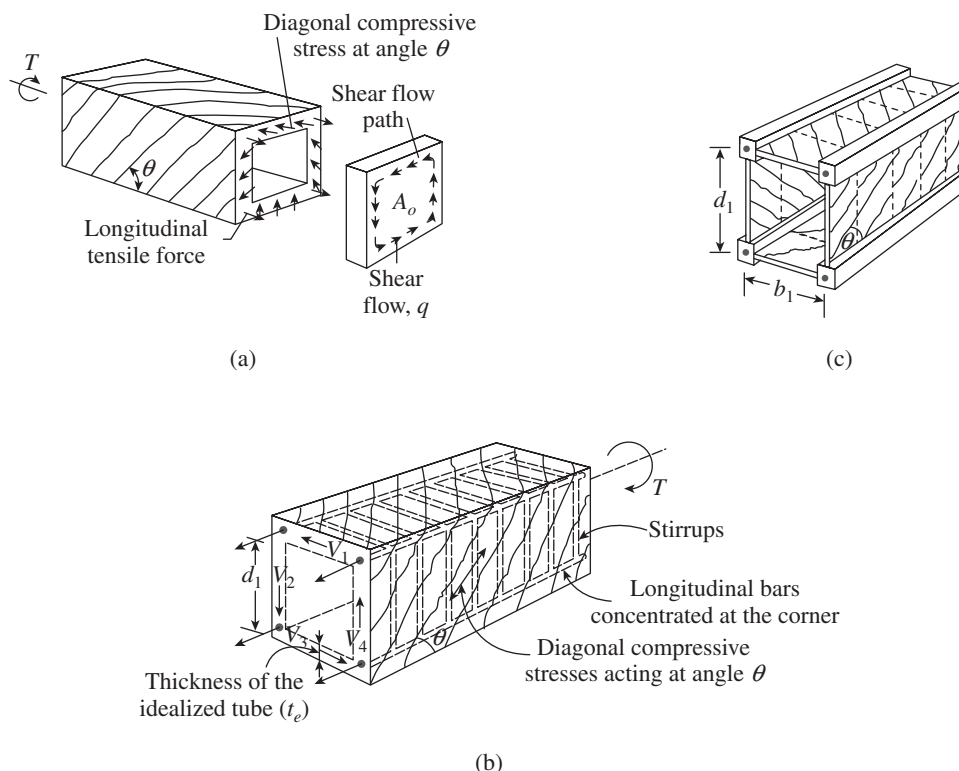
Thin-walled tube or plastic space truss analogy (a) Thin-walled tube analogy (b) Space truss analogy (c) Idealized section of the truss
